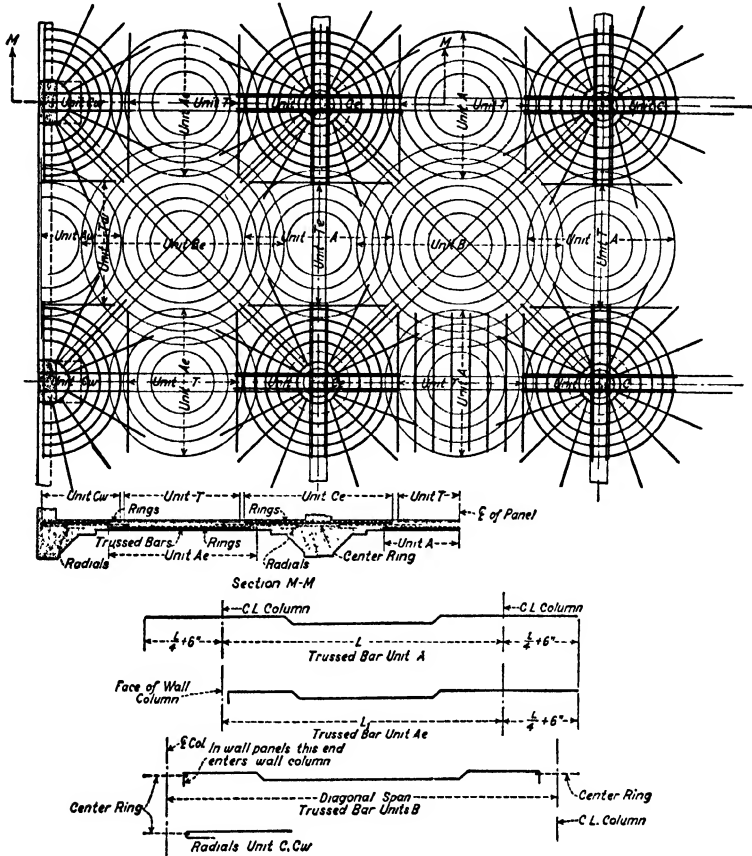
Typical Smulski Flat Slab Reinforcement for Interior and Exterior Panel. (See p. 367.)
